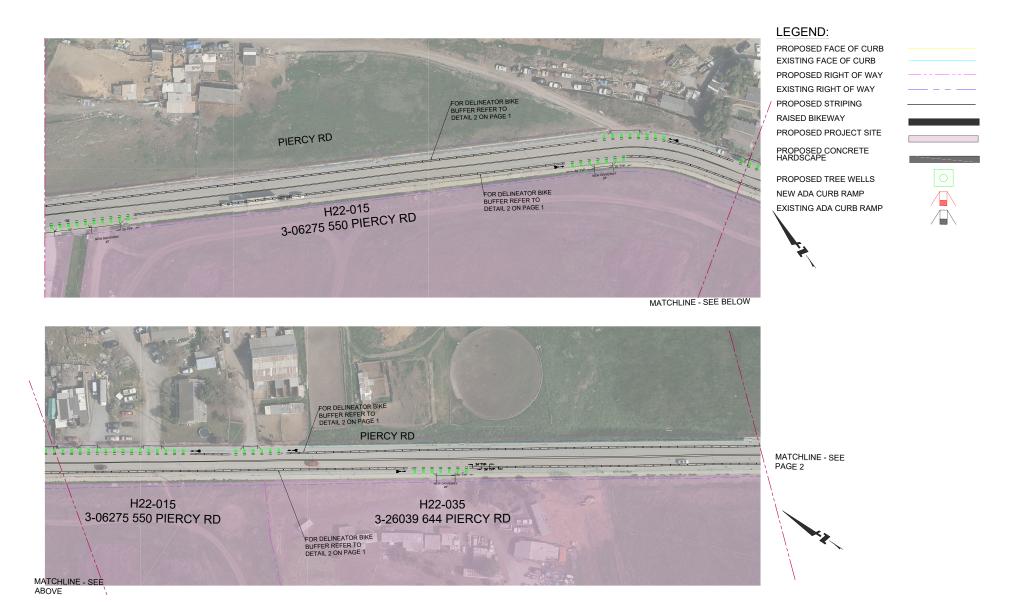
Piercy Road - Tennant Avenue Bikeway Improvements
